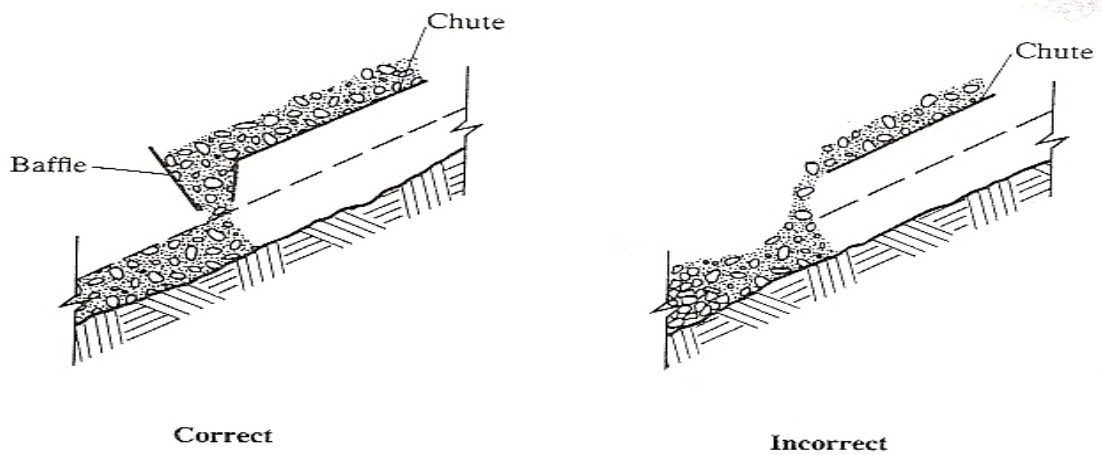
Placing on a sloping surface (based on ACI Manual of Concrete Practice)
